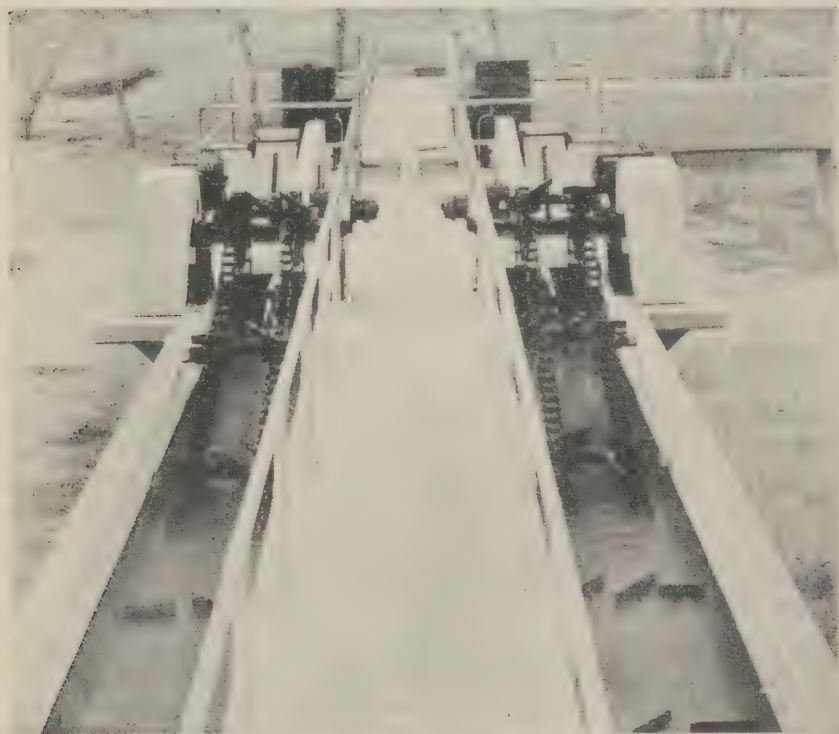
Grit chambers with mechanical equipment for removing grit.
